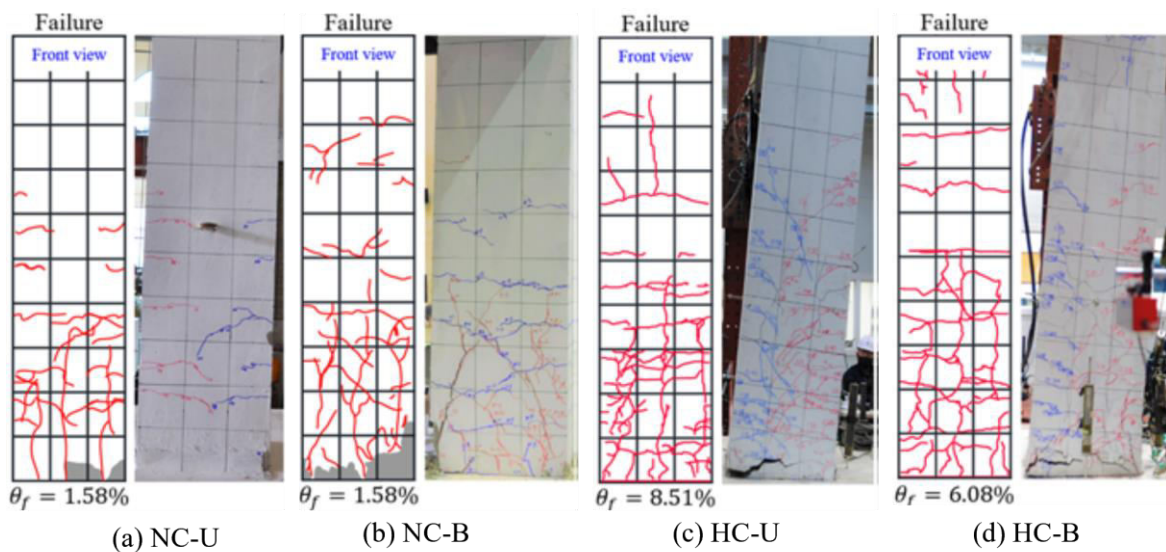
Damage in column specimen at failure ( $\theta_f$ )
